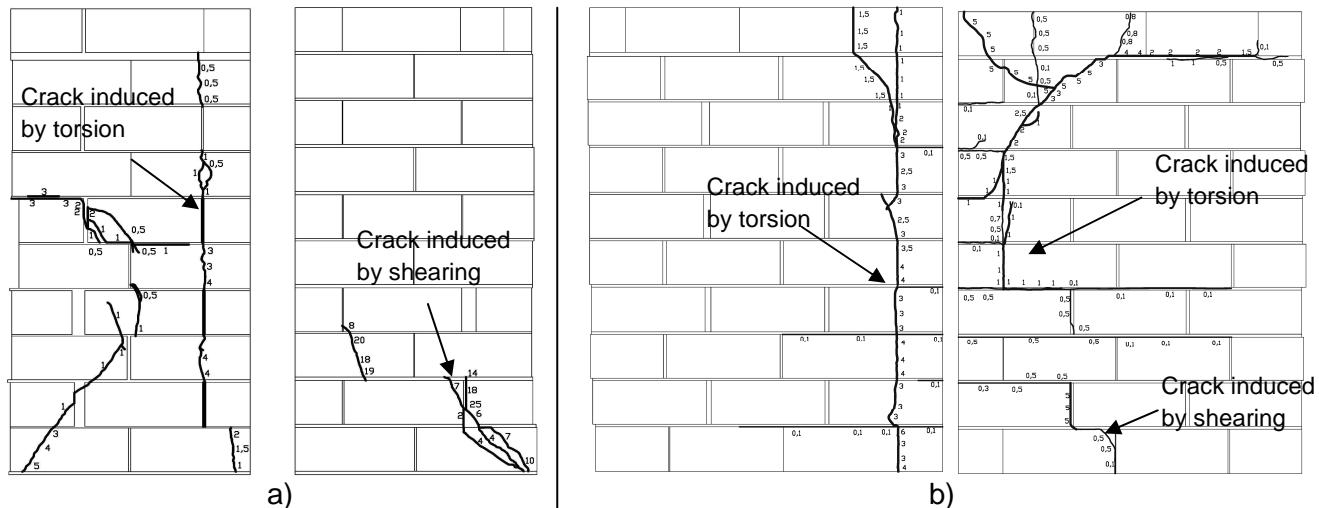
Failure modes of the two return walls: a)Wall 1; b)Wall 2
